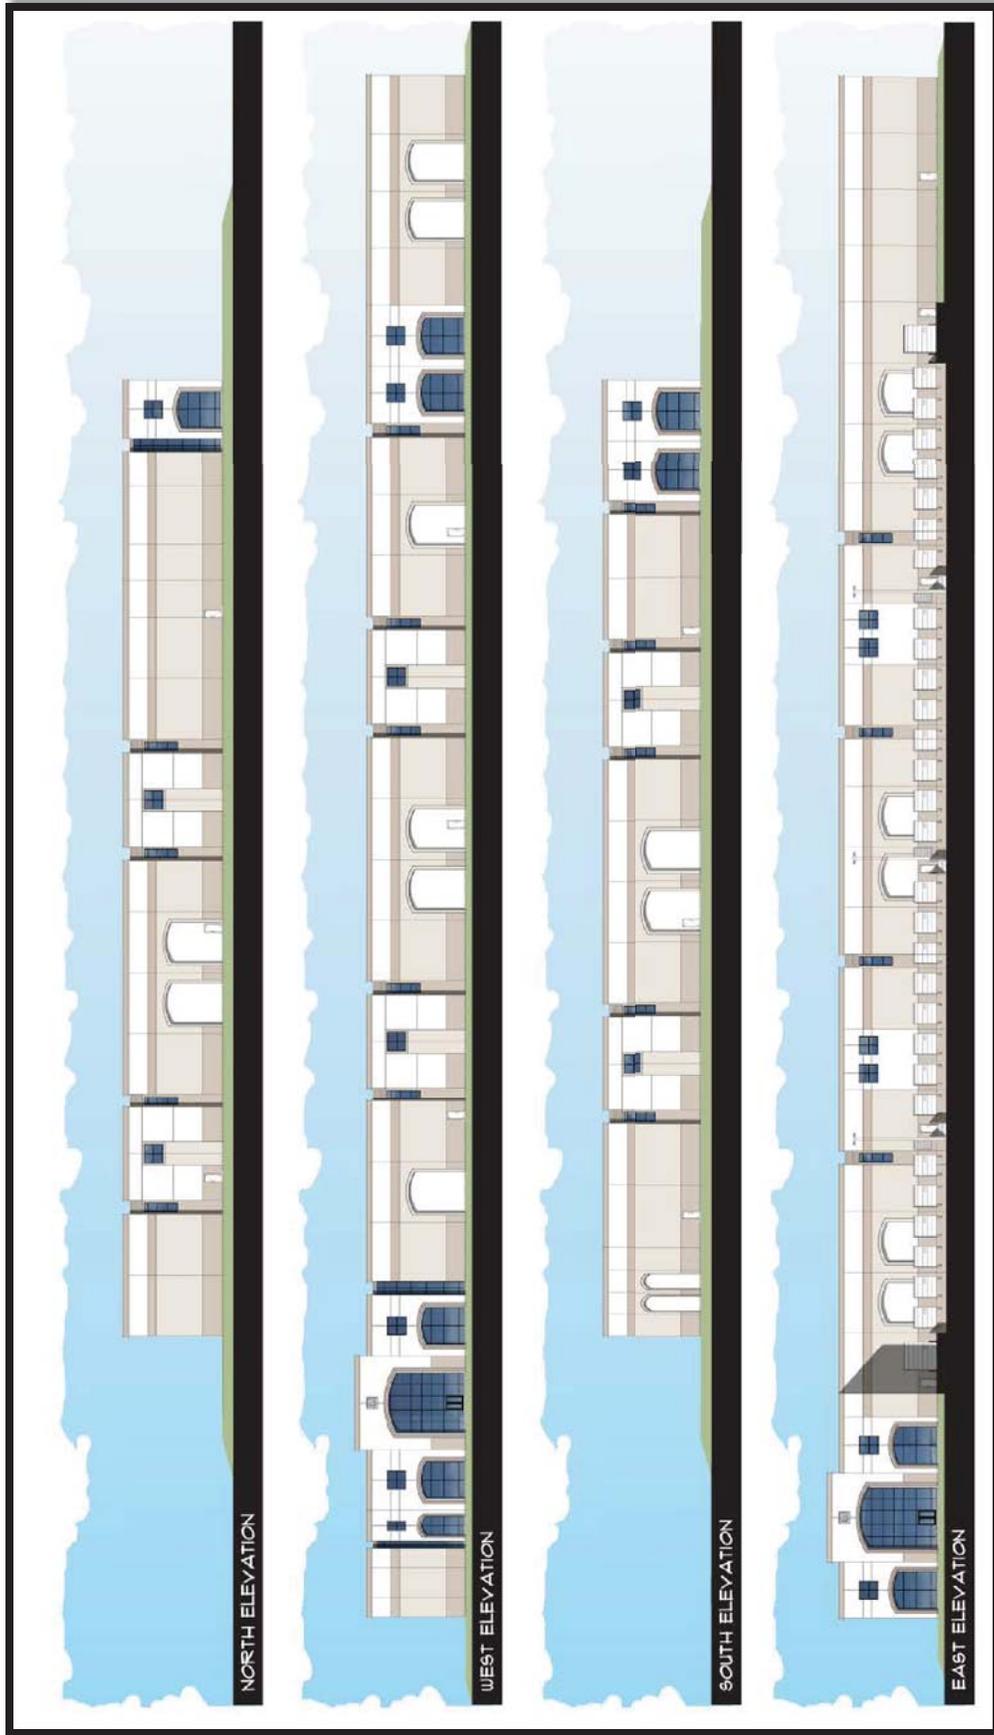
CONCEPTUAL BUILDING FORM
